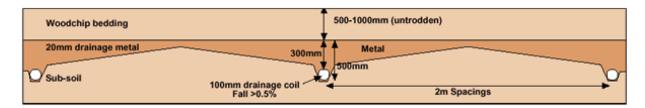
CROSS SECTION OF TYPICAL NEW ZEALAND OWP
